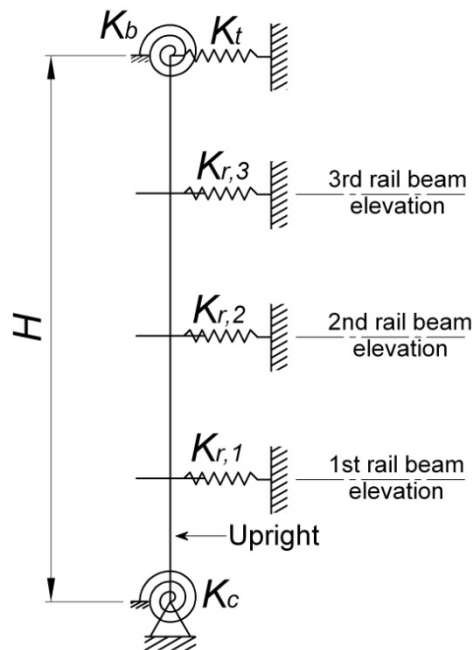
Single upright model with rail beam restraints for a 4 stories (3 rail beam elevations) drive-in rack
